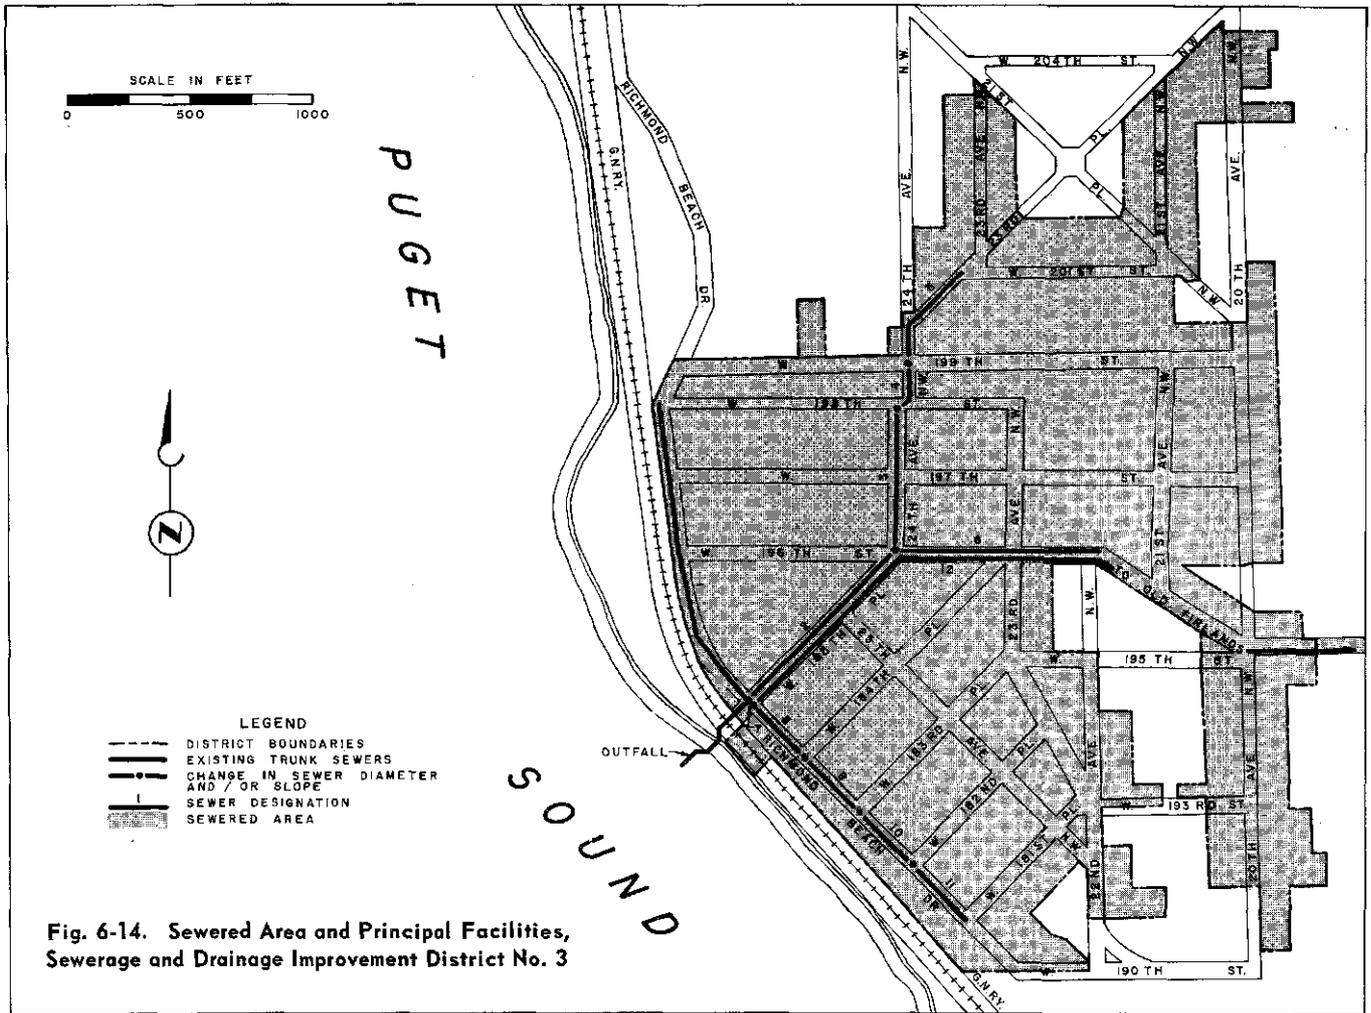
Sewered Area and Principal Facilities, Sewerage and Drainage Improvement District No. 3
